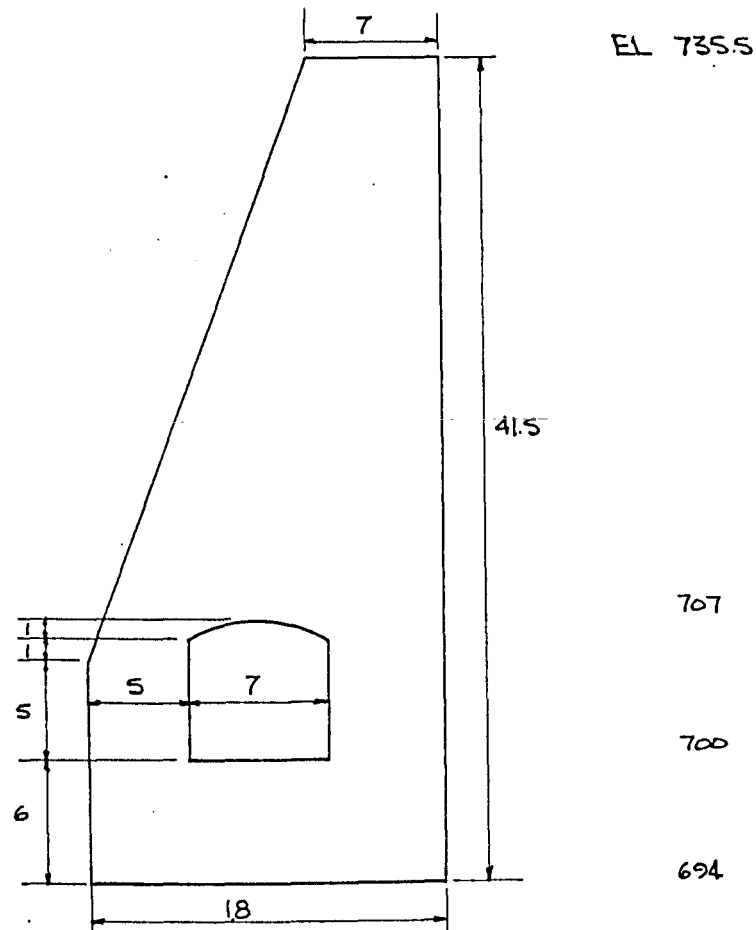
RIVER WALL - UPPER CHAMBER R-15
